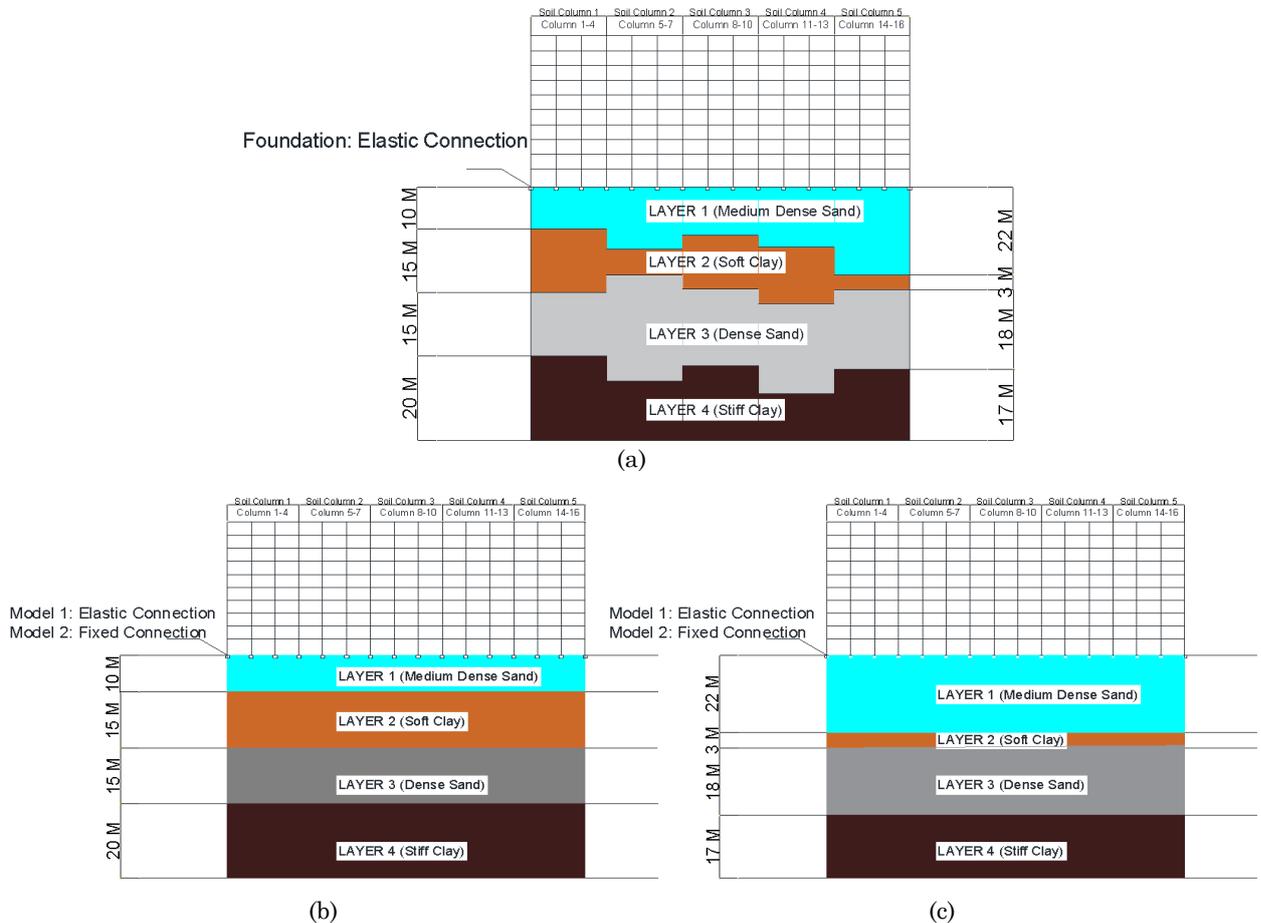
Structural and Foundation Soil Models used for This Study: a) Building on Variable Soil Conditions; b) Building on Uniform Soil Conditions with Thick Soft Clay; c) Building on Uniform Soil Conditions with Thin Soft Clay
